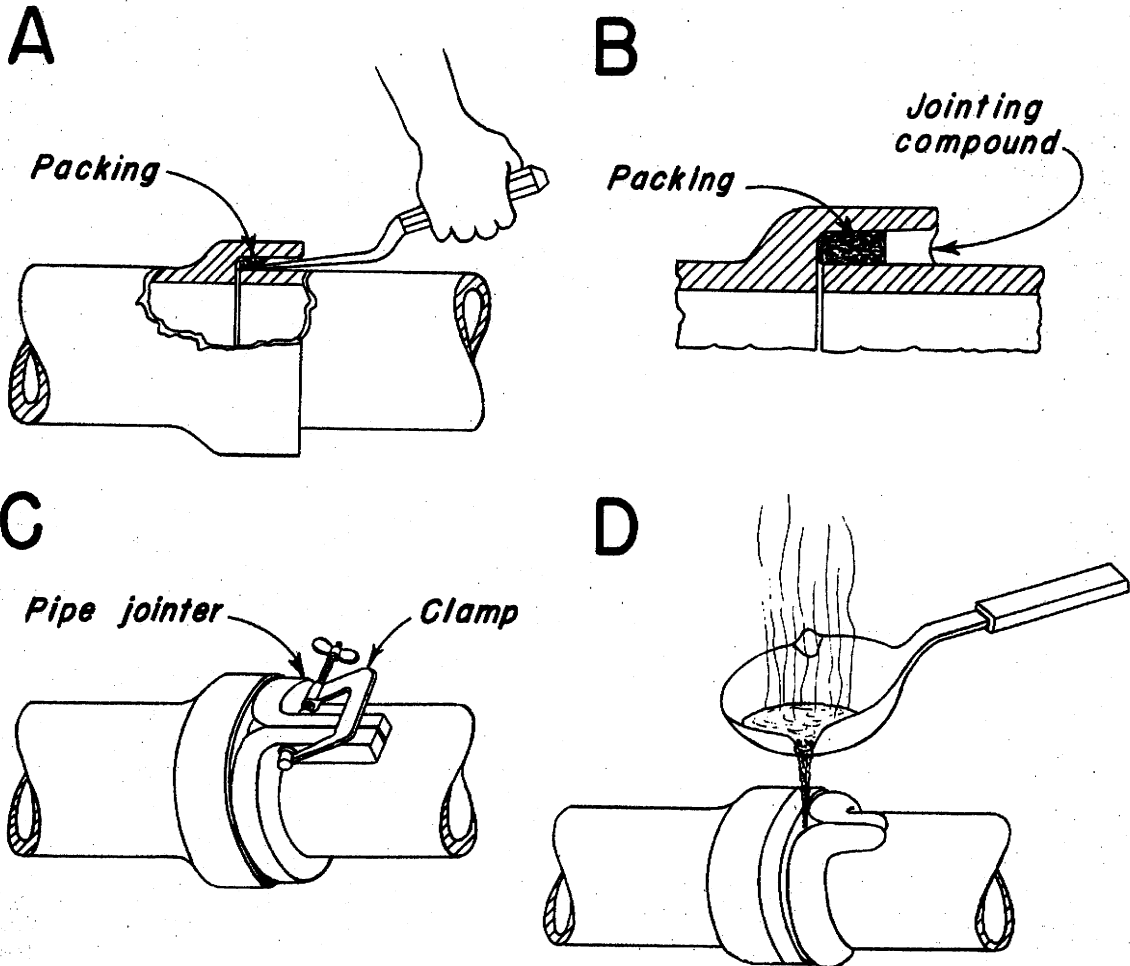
Methods of jointing bell-and-spigot sewer pipe. A, Using calking iron to force packing into joint. B, A completed joint. C, Use of asbestos runner clamped around pipe, for pouring hot joint. D, Clay roll used in place of asbestos runner.
